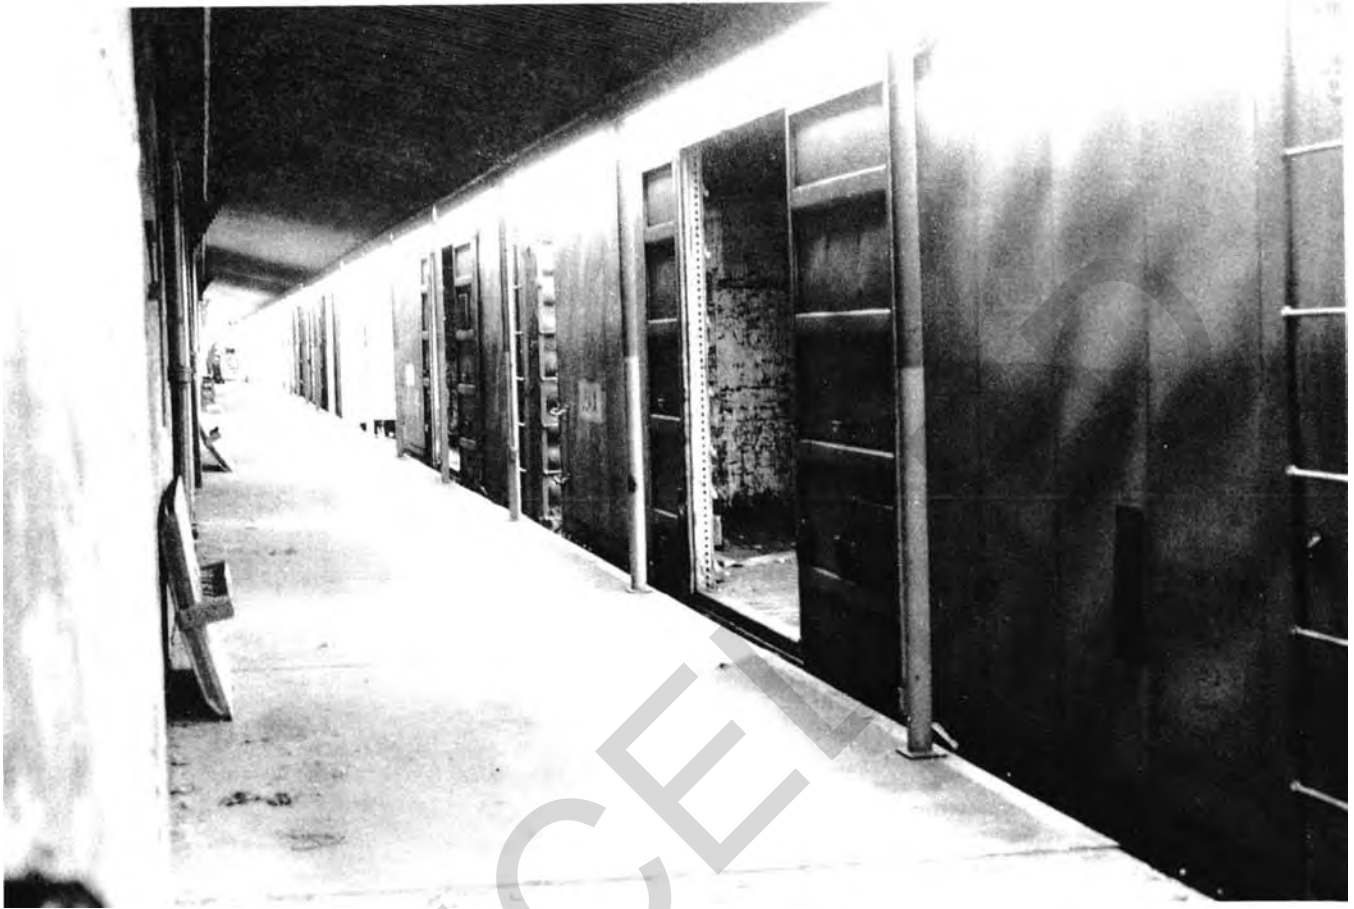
Typical loading dock with height equal to rail car floor height.
